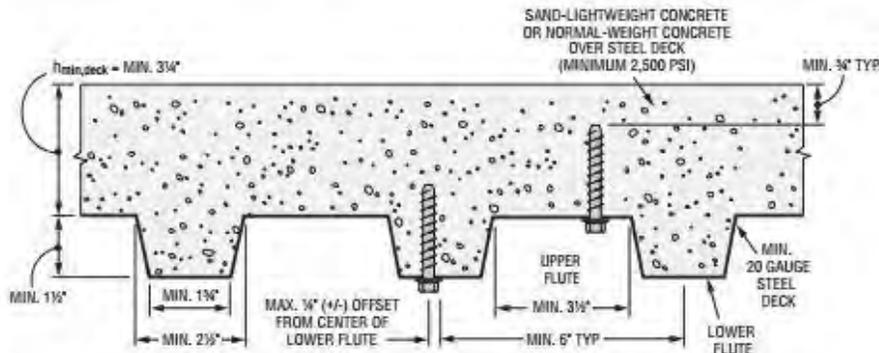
Figure A. Installation in the Soffit of Concrete-Filled Profile Steel Deck Floor and Roof Assemblies
